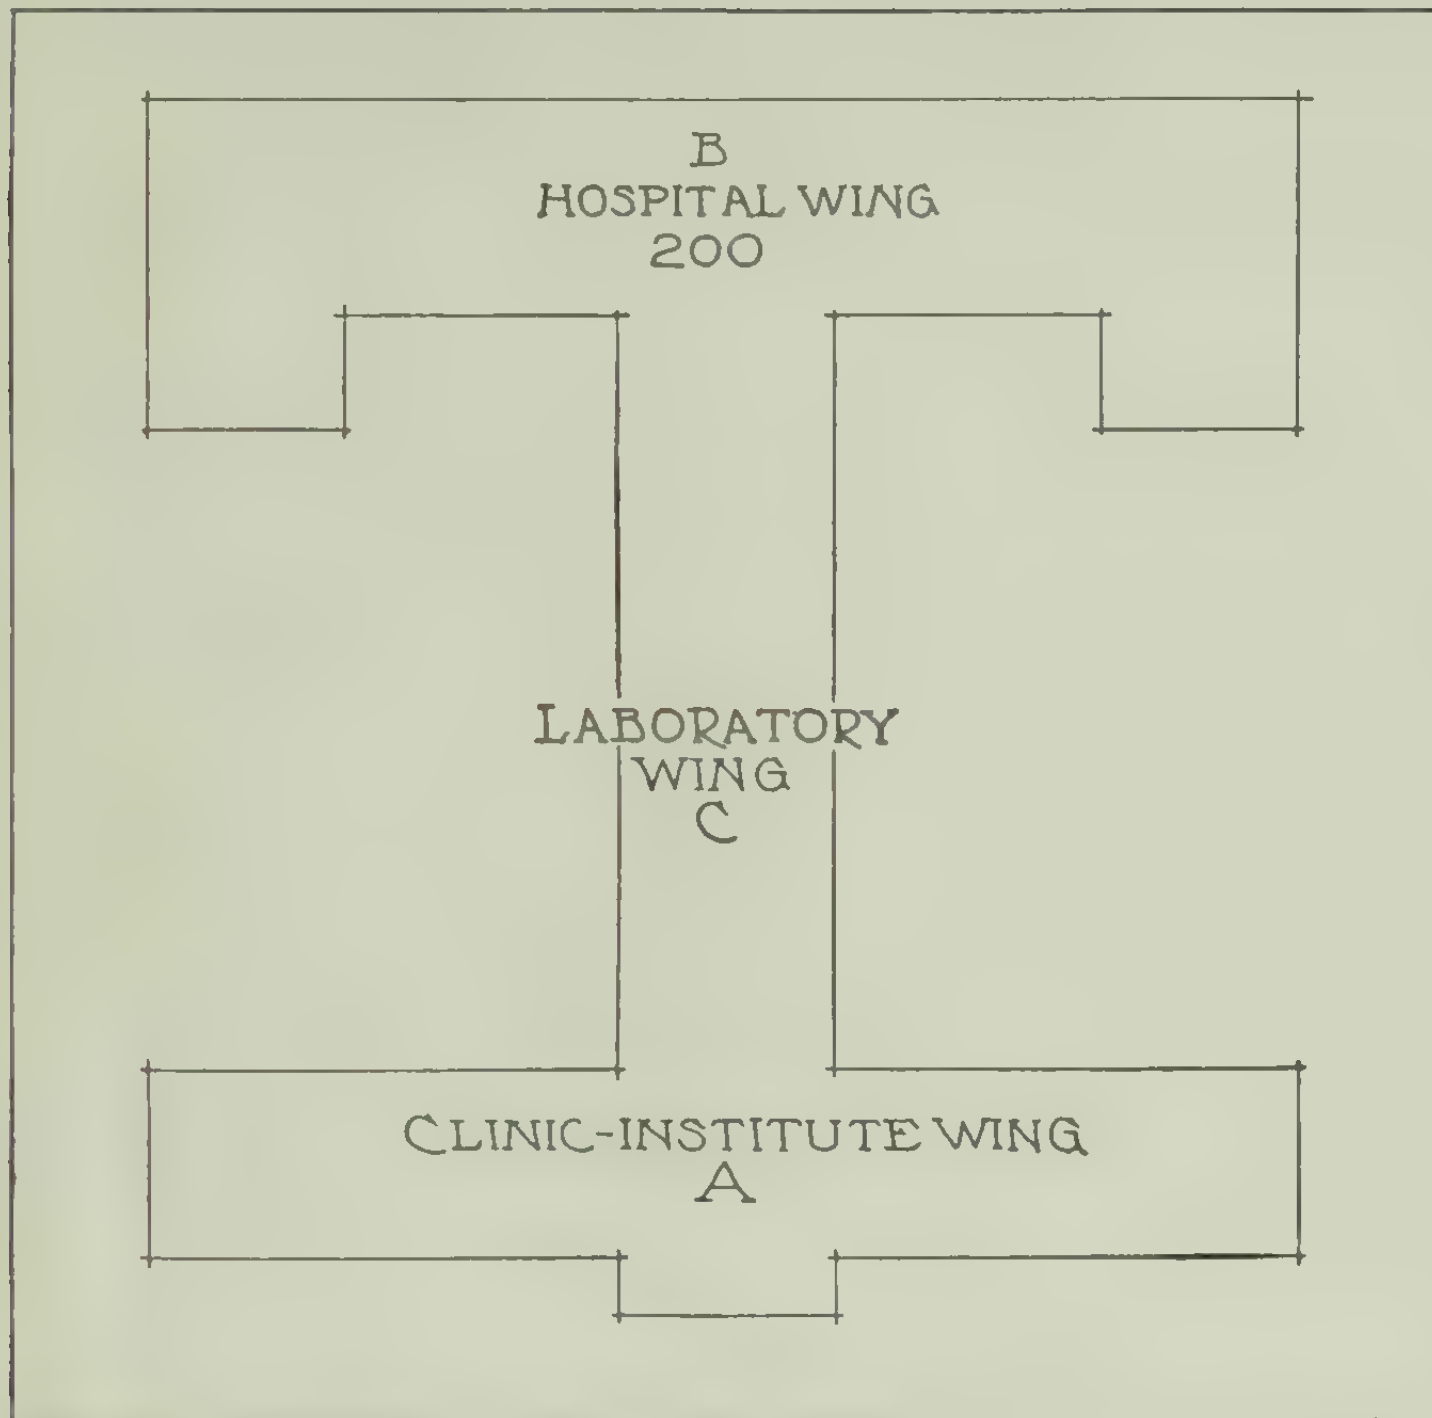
DIAGRAMMATIC PLAN OF PROPOSED BUILDING FOR A PSYCHIATRIC INSTITUTE HOSPITAL IN NEW YORK
